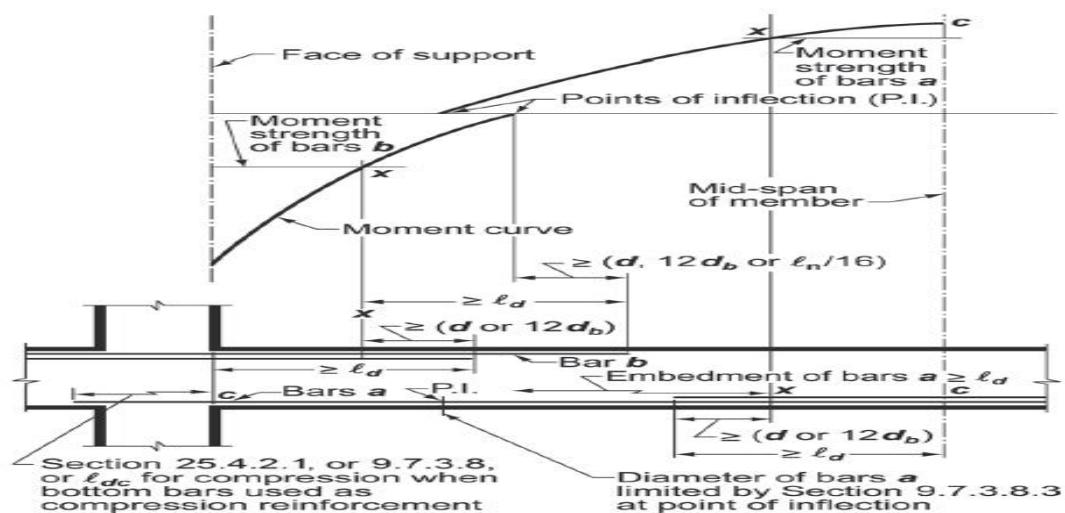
Development of flexural reinforcement in a typical continuous beam.
